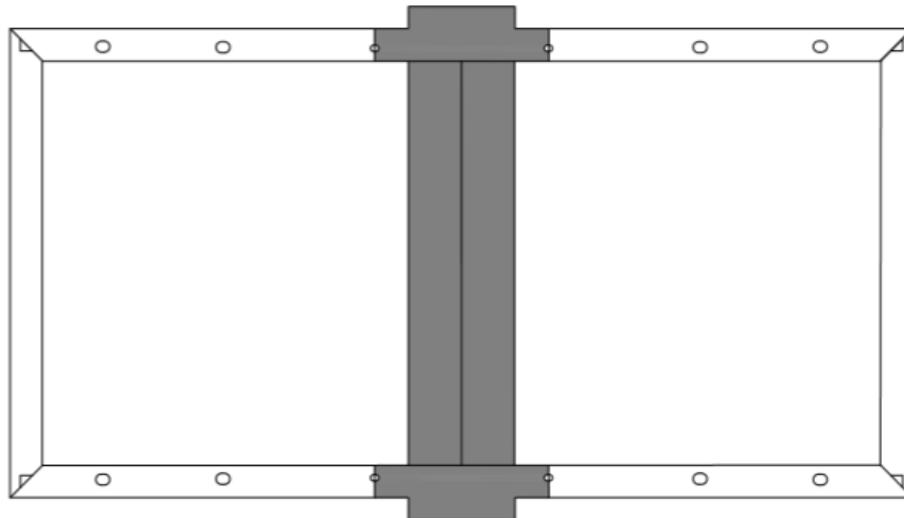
PV module installed with bolt fitting method (NEXTracker)
